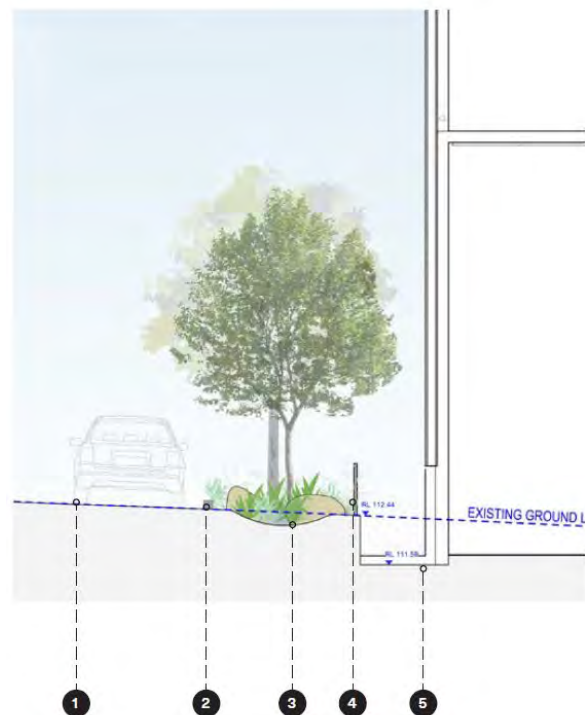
Building J Landscape Plan (ASPECT Studios)
